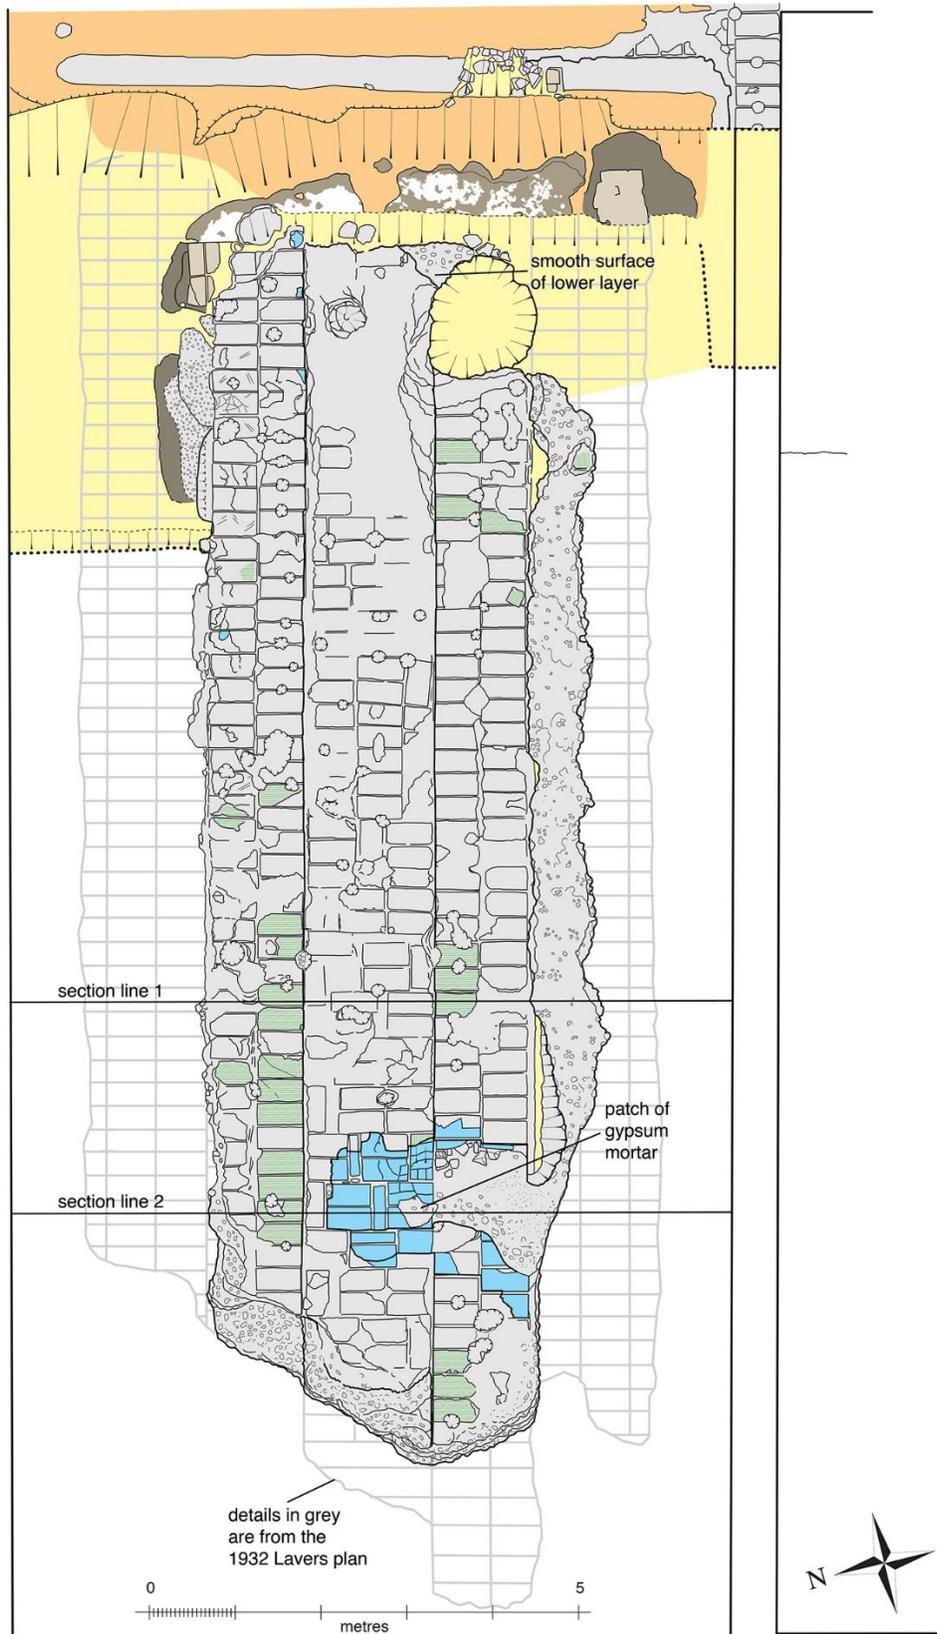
Plan of the gypsum-concrete foundation bed (the ‘causeway’) located between the foundations for the two large sets of columns that fronted the pylons of the temple. Plan by J. Friedrichs. The network of grey lines shows details taken from Lavers’ plan of 1932, when more remained of the edges of the foundations.
